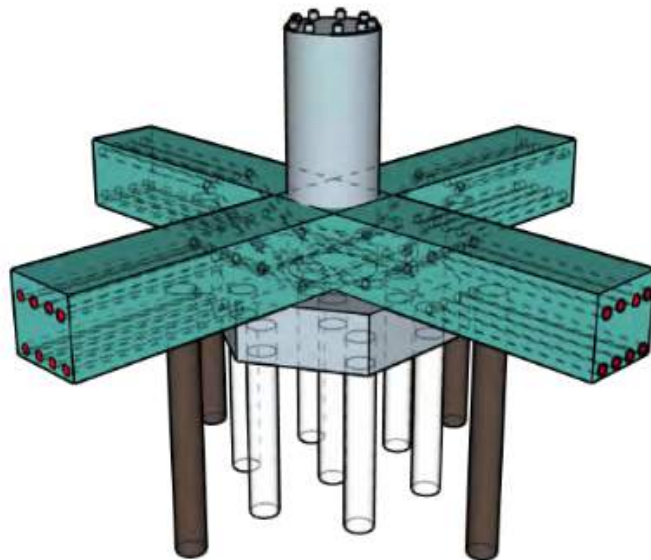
Grade Beam and New Pile Retrofit for Existing Foundations
